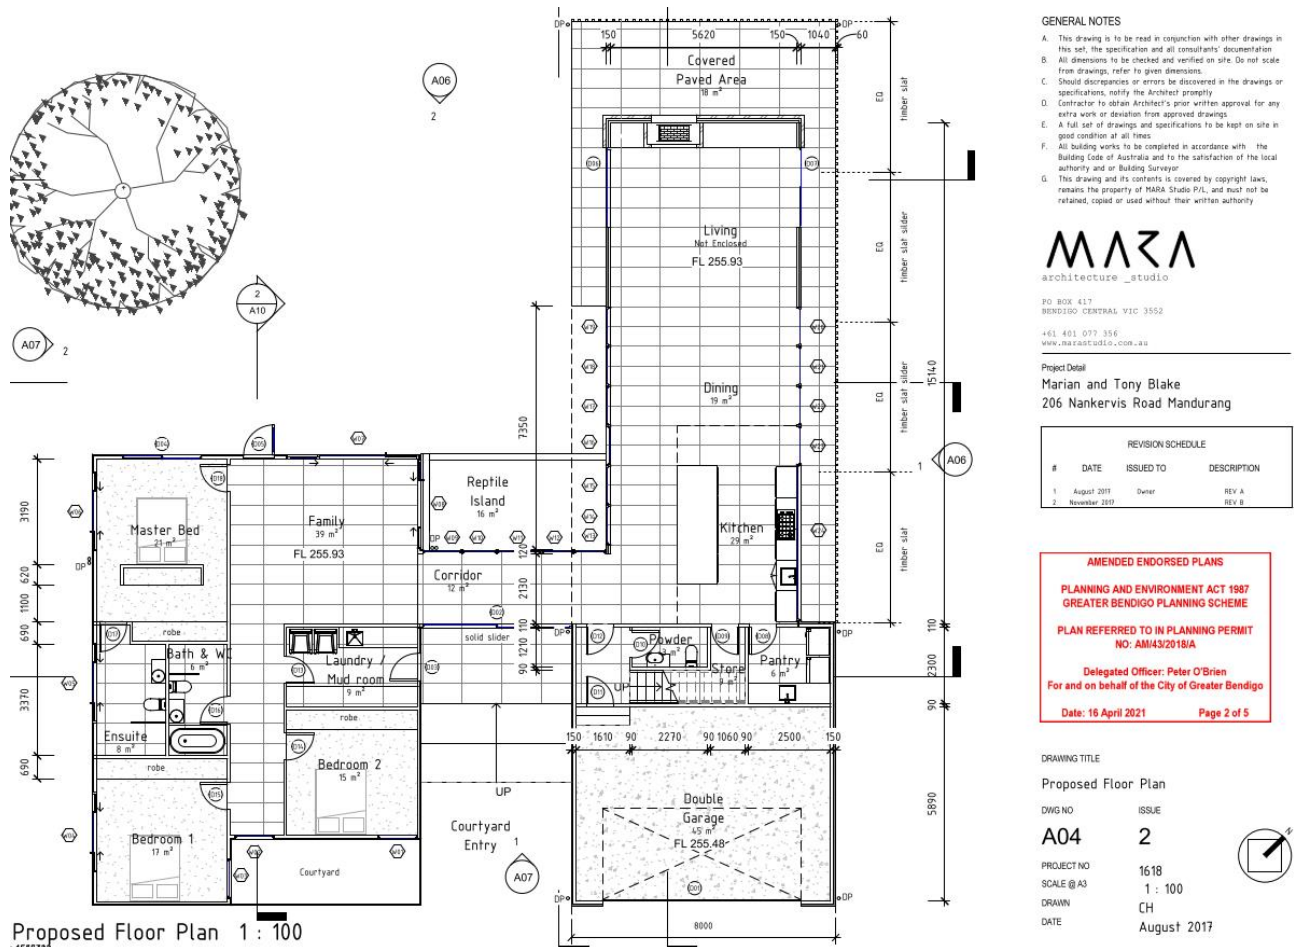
Endorsed Proposed Floor Plan – DR/43/2018
